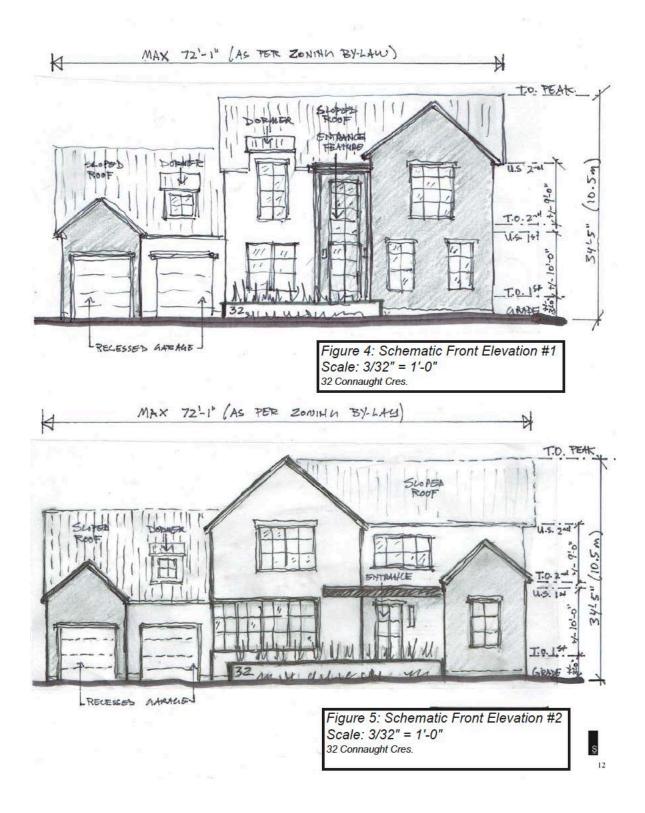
Proposed concept elevations, option 1 and 2. Provided by Studio Spagnolo Inc.
